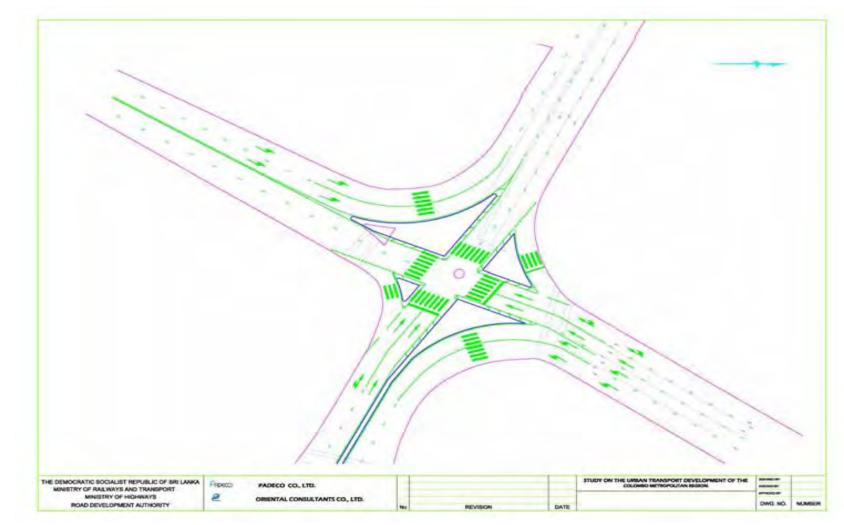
Proposed Geometric Improvements to York Street Intersection
